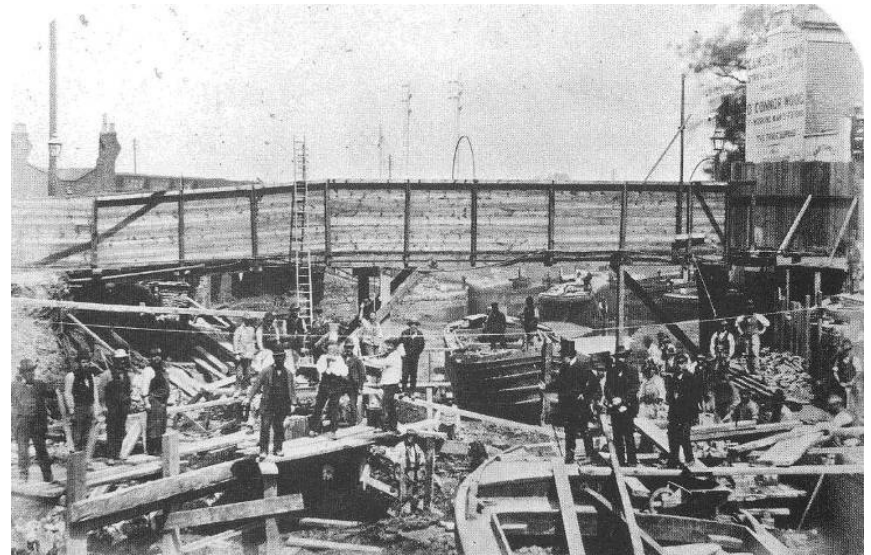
The Construction of the iron Hampstead Road Bridge, by St. Pancras Vestry and Metropolitan Board of Works, 1876
